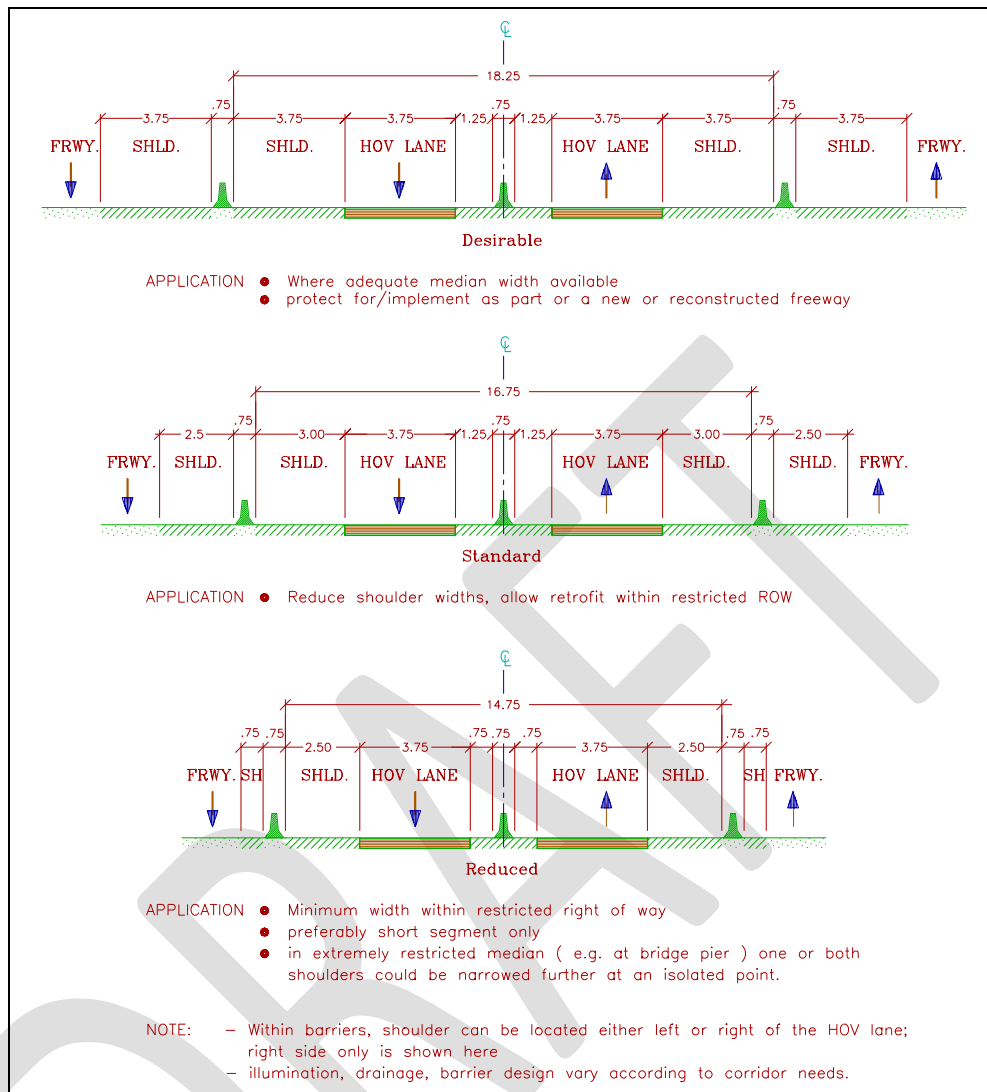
Two-Way Barrier-Separated HOV Facility Cross-Sections
